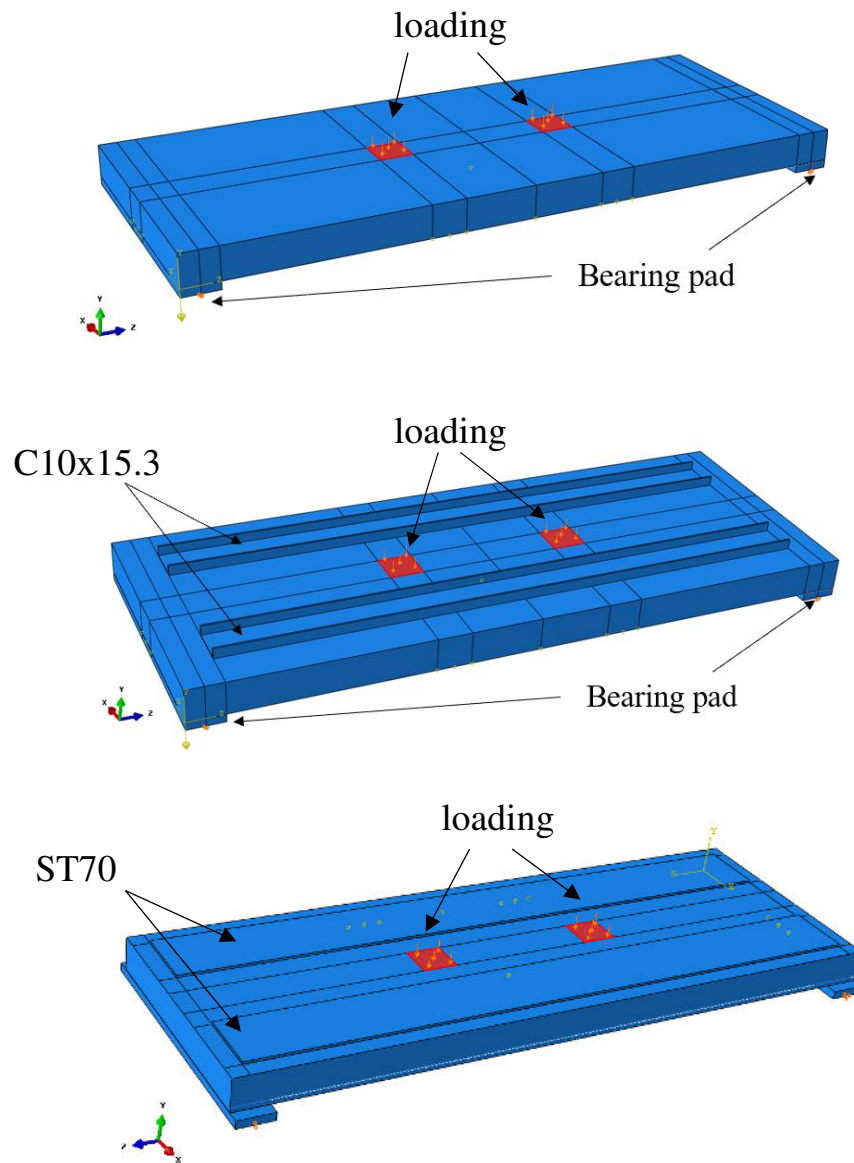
FE modeling of precast reinforced flat slabs with and without strengthening.
